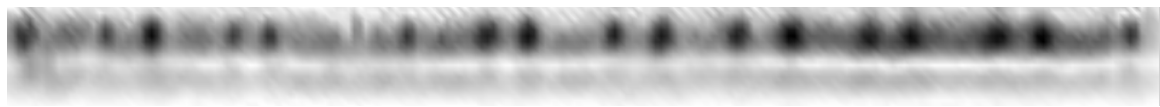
Imaged walkway area and reinforcement bars prior to concrete overlay.
